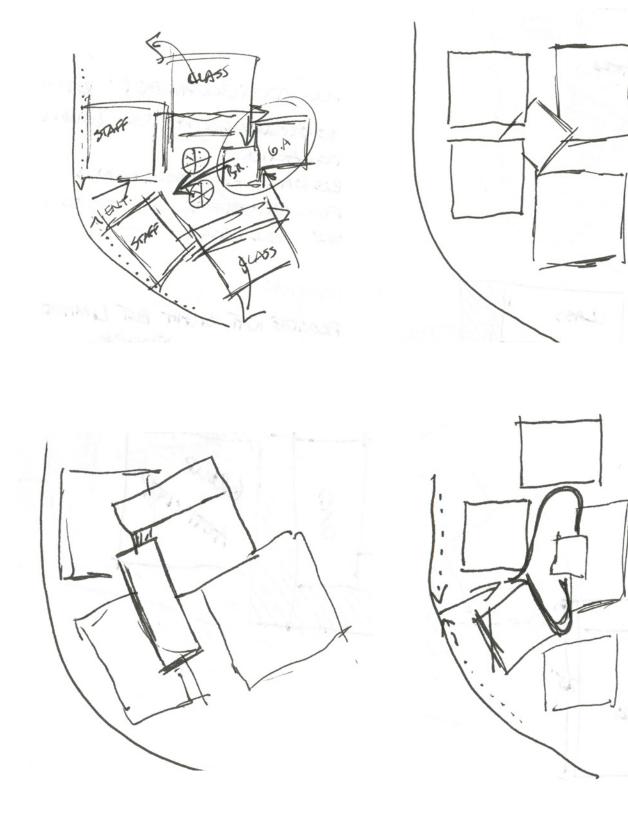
Spatial Arrangement Sketches 2 Hausladen, G. (2013). Spatial Arrangement Sketches 2. [Designer]
